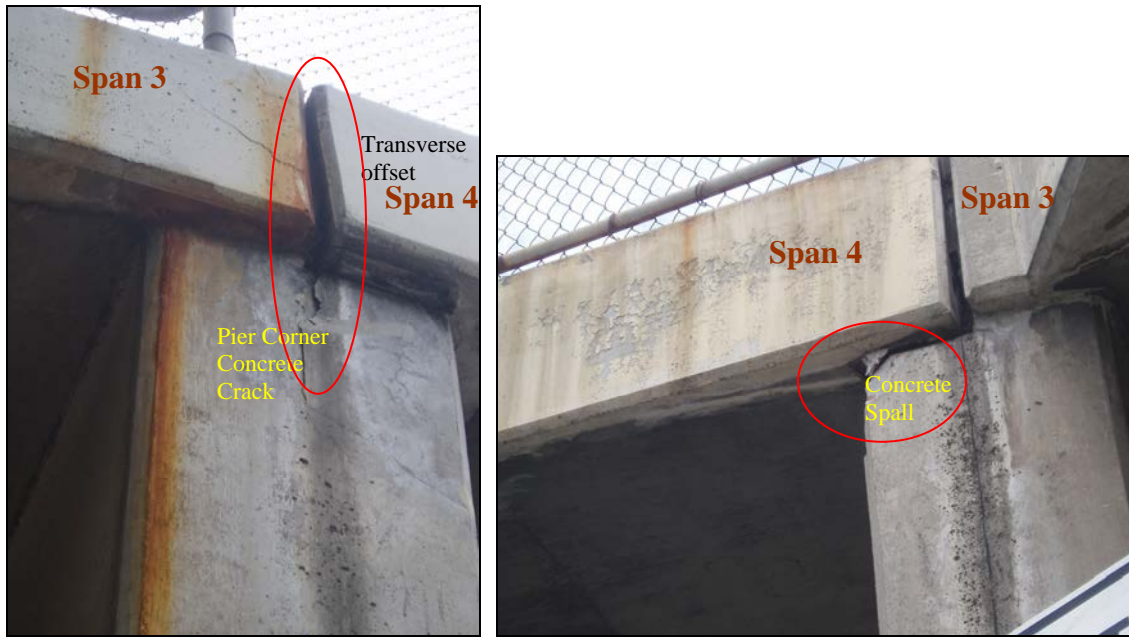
Concrete cracking and spalling at Pier 4 under Span 4.
